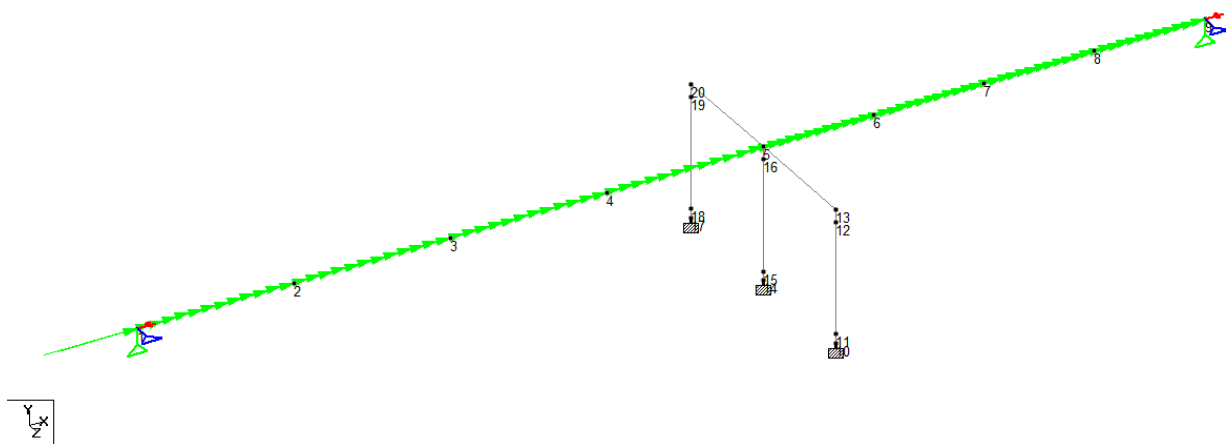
Bridge model under longitudinal load of 100 k/ft
